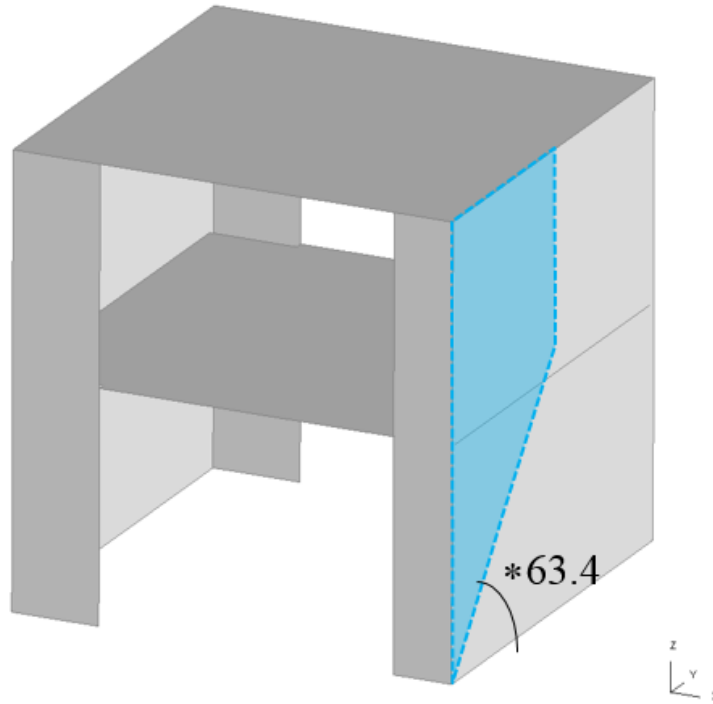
Portion of the transversal wall, assumed to contribute on the in-plane behaviour [14]
